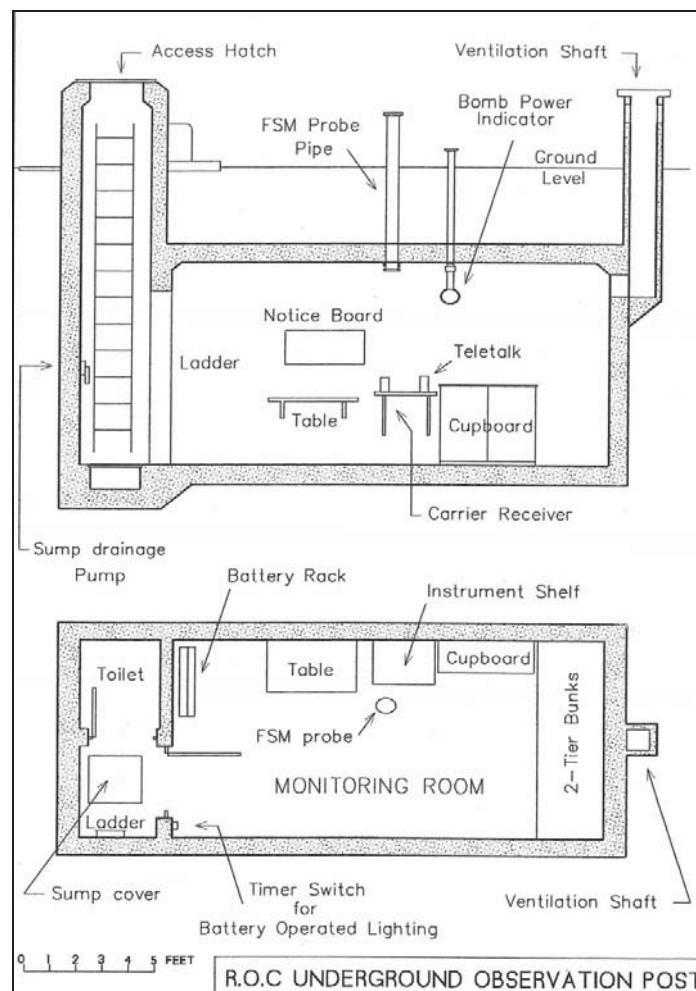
Building drawing plan and elevation of a 1960s Royal Observer Corps Nuclear Monitoring Post (McCamley 2007)
